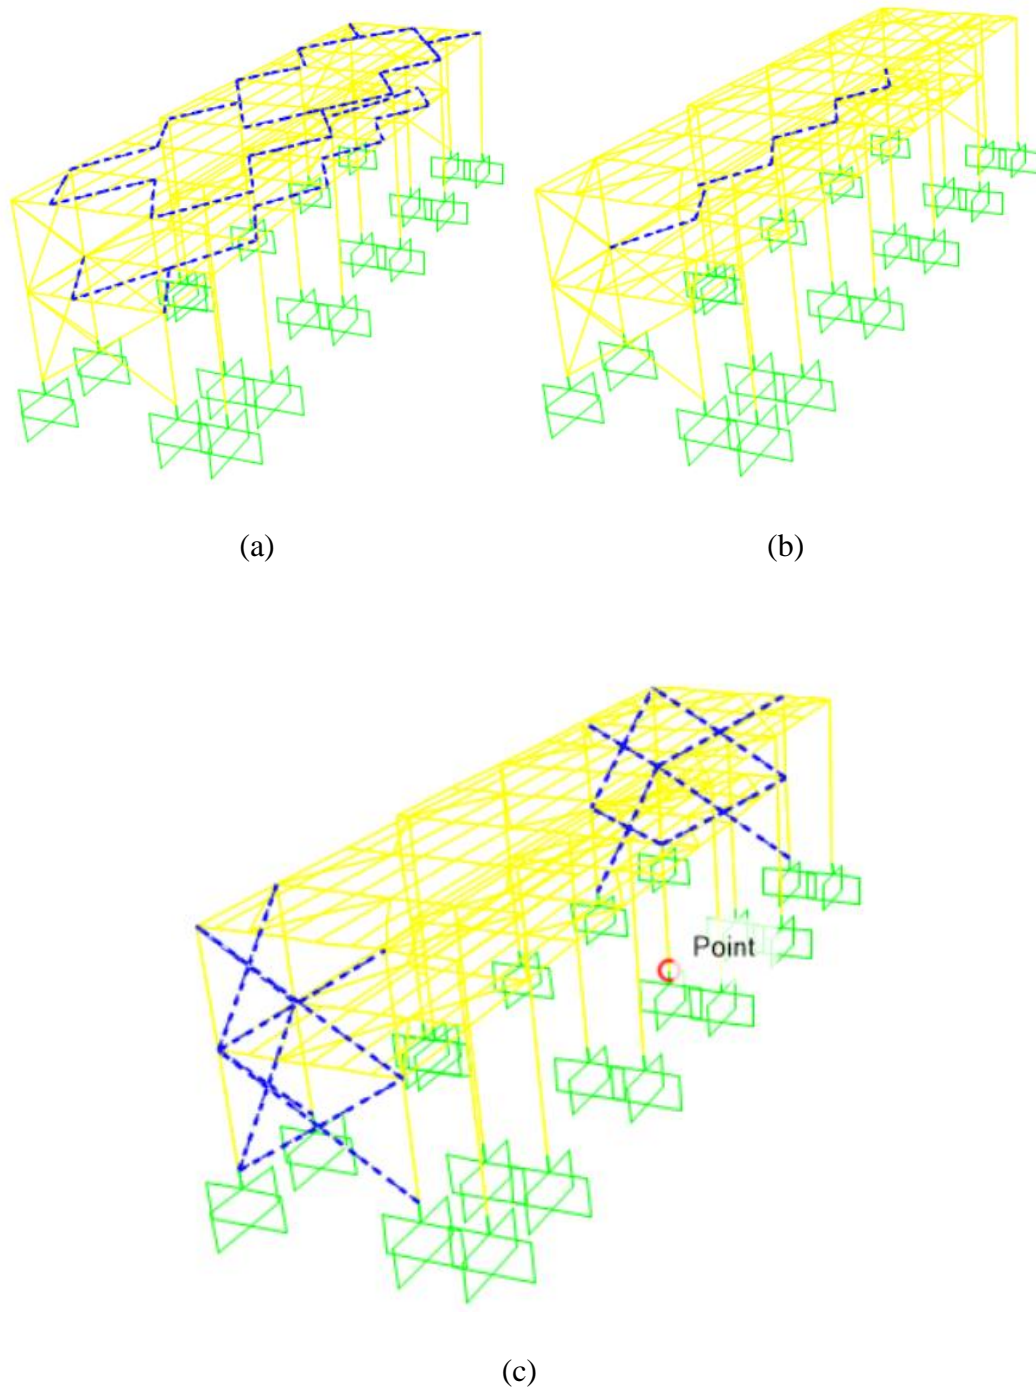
The brace member groups for the 551-member steel frame: (a) lateral braces1, (b) lateral braces2, (c) vertical braces
